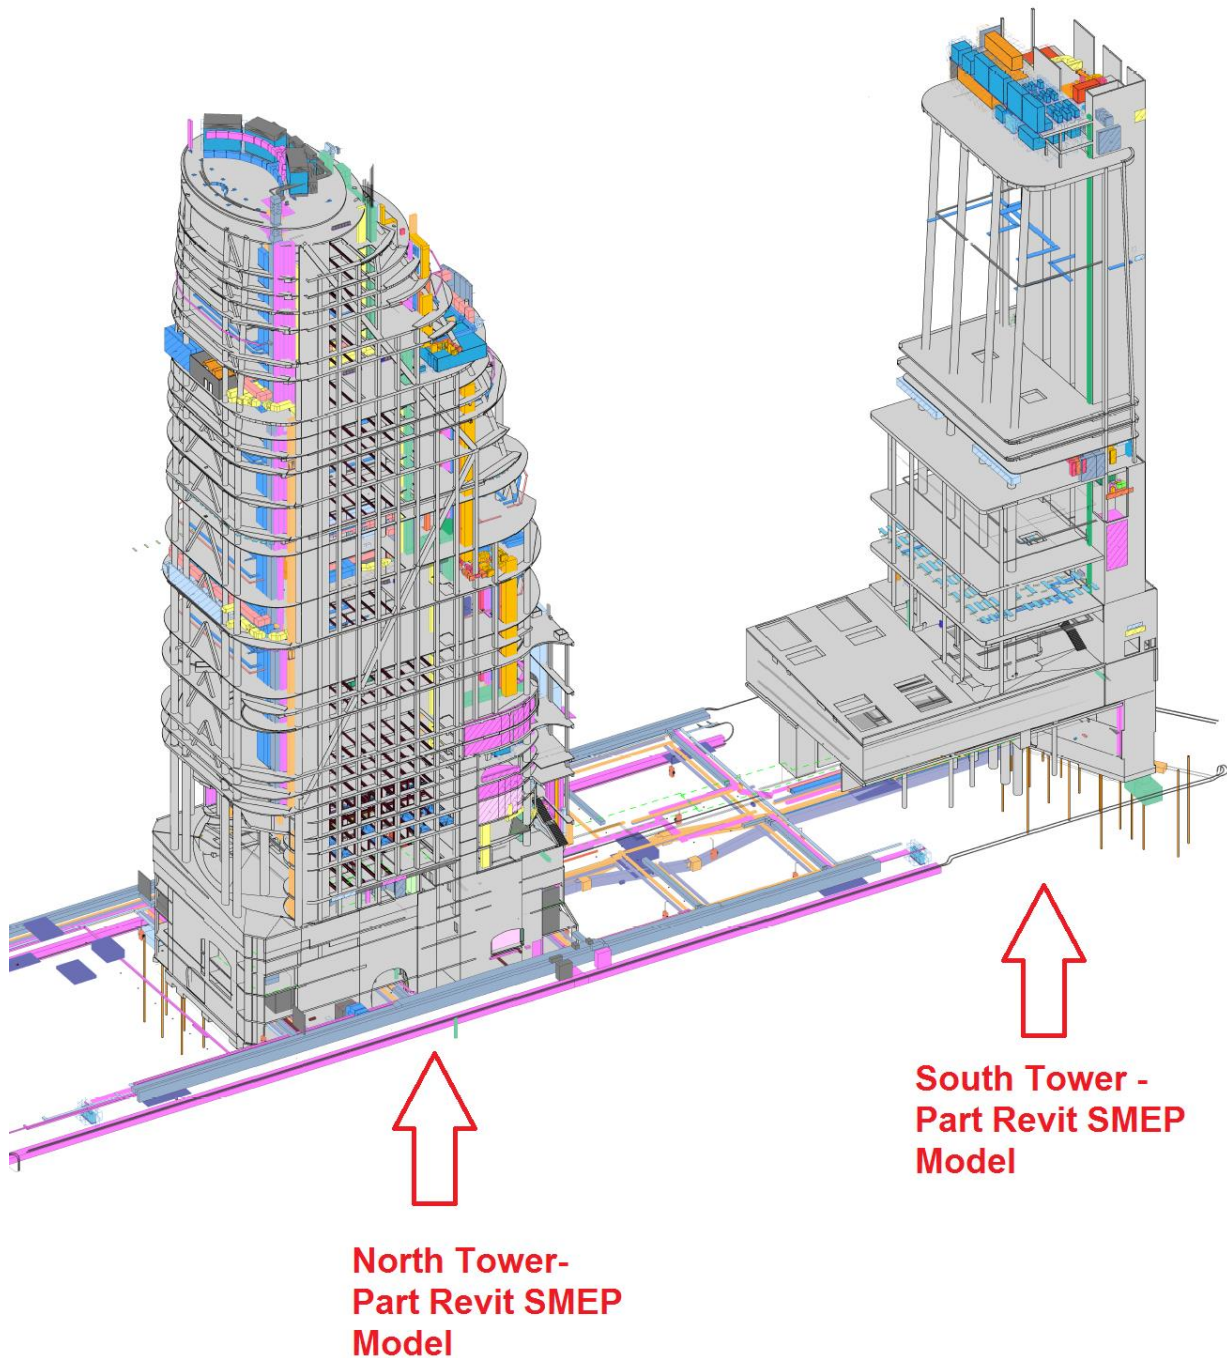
Combined OSD + Station 3D Structural and Building Services Model
